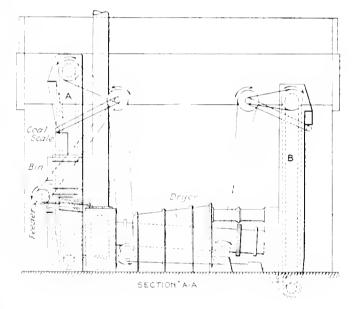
40-Ft. by 60-Ft, Coal Mill, Elevation showing Dryer
